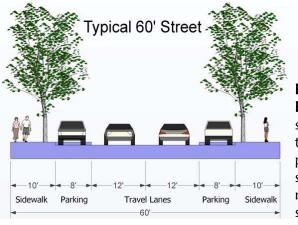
R: Typical 60-Foot Street crosssection, with two travel lanes, parallel parking and 10 foot sidewalks. Parking reduction is in favor of sidewalk widening and streetscape amenities.
